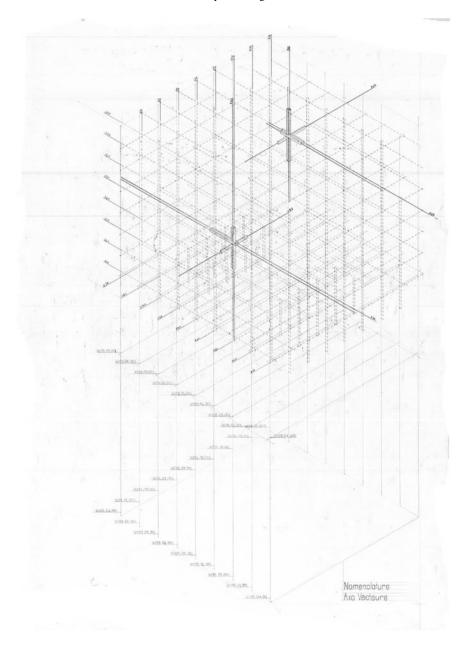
Axonometric view of the two wood assembly, located using vectors in the tridimensional grid of the protostructure. Pencil drawing on paper. © ALICE EPFL
